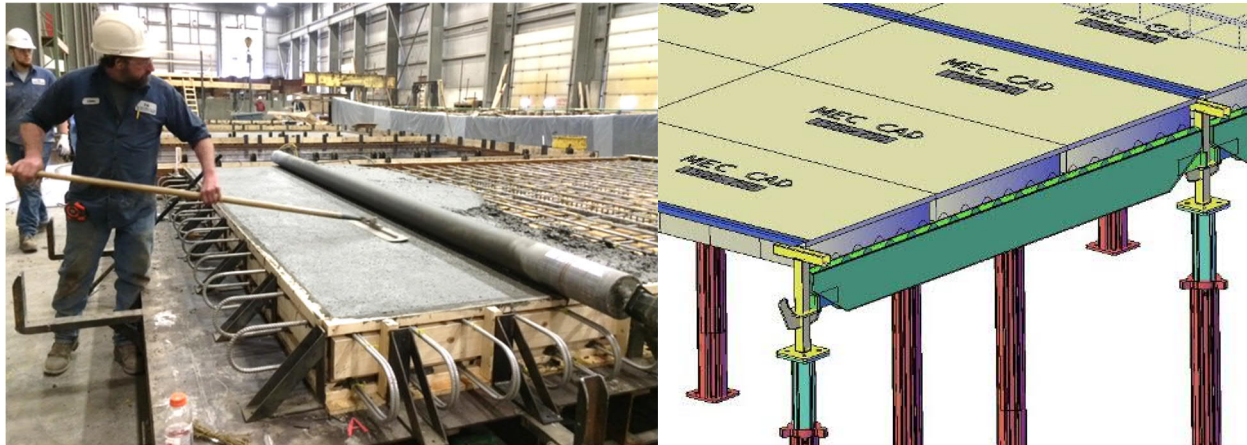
Using 3D models to plan formwork for off-site fabrication.
